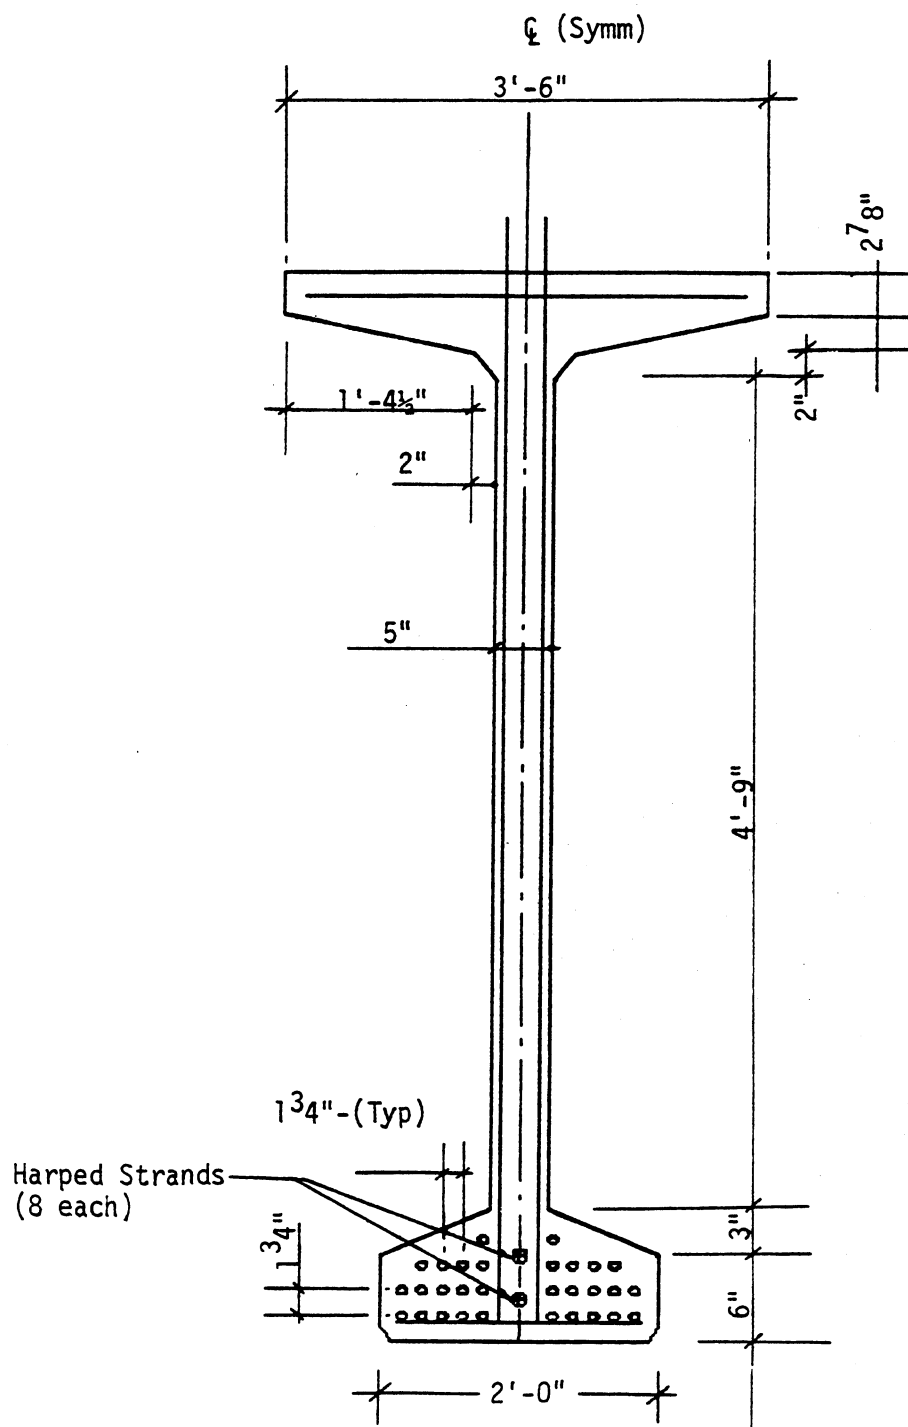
Field Test - Section through Mid-span of Girder 50
